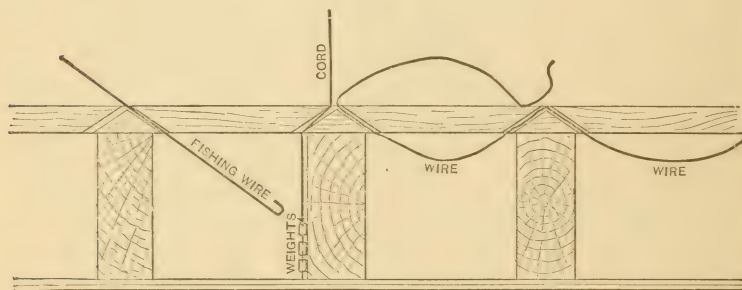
FISHING BELL WIRE UNDER FLOOR.
